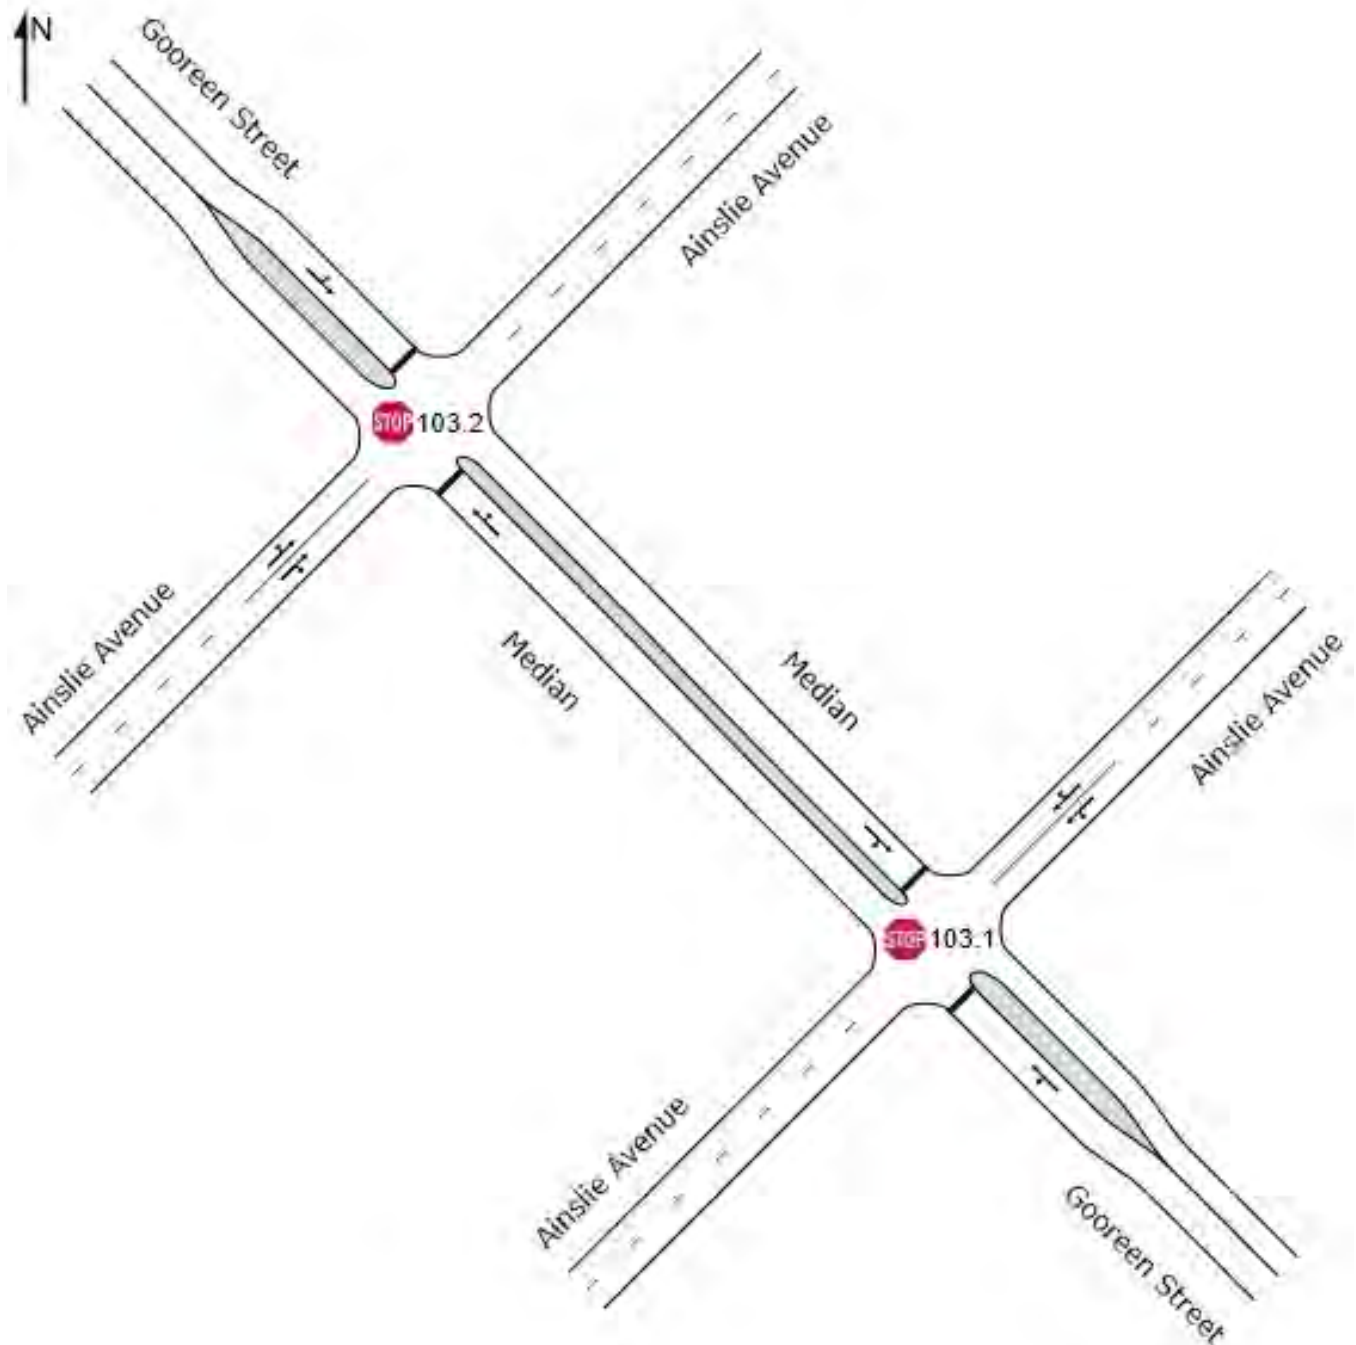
Current Intersection Layout – Ainslie Avenue / Gooreen Street
